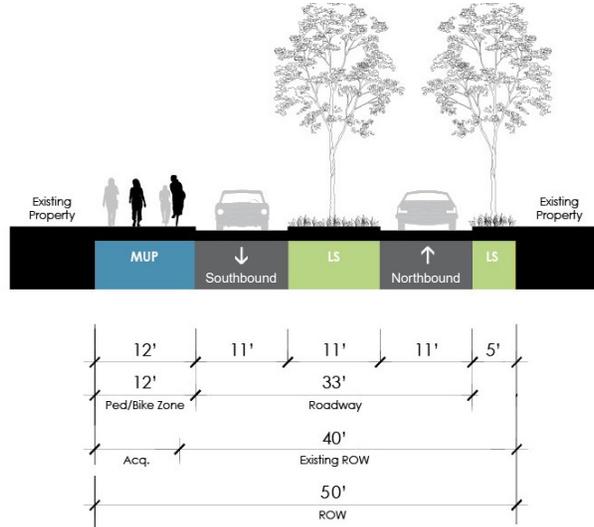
Typical Section Segment 2 (20th St NE to 22nd St. NE)
